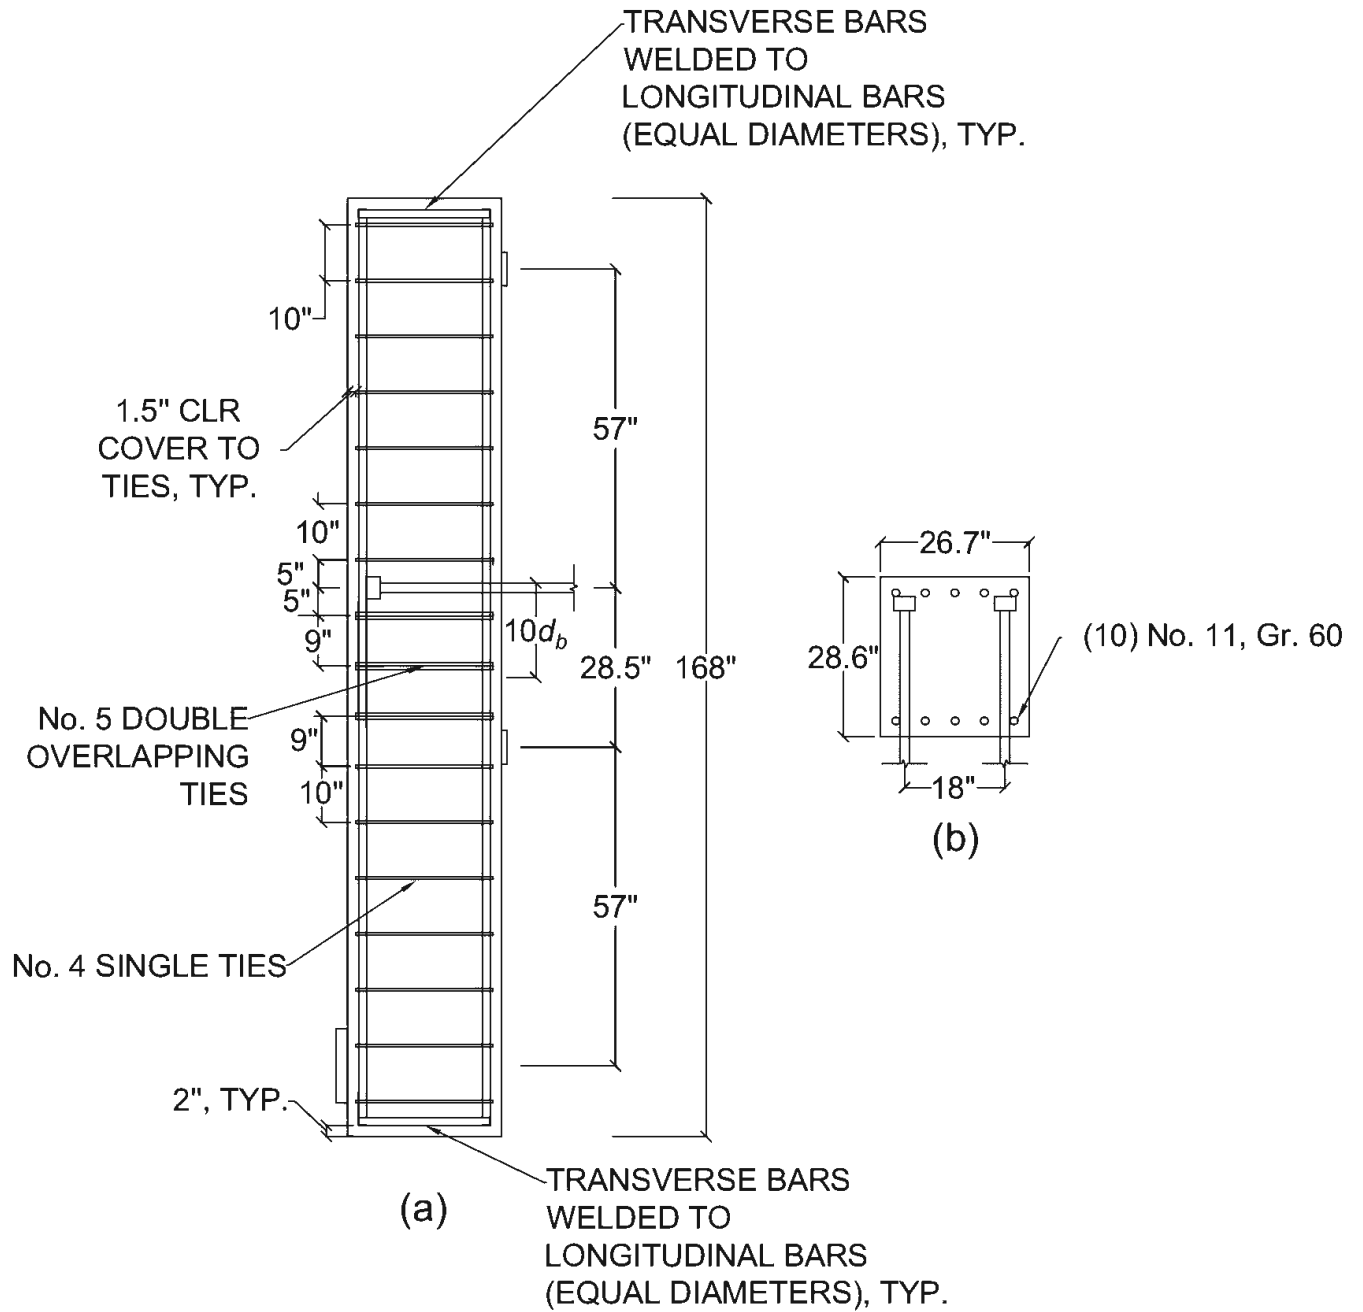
Details of reinforcement layout for No. 14 headed bar specimen 14-16E: (a) elevation, (b) cross-section
